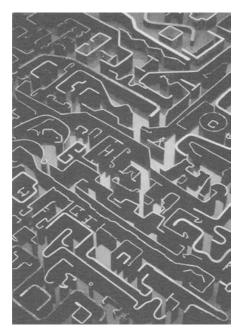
Collection of different cold-formed section shapes (Trebilcock, 1994).
